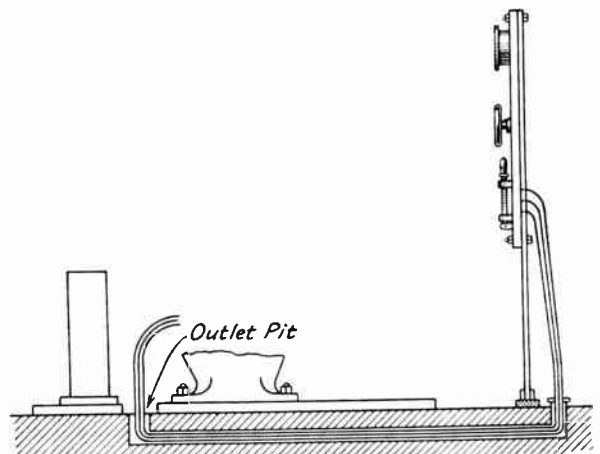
CABLE RUN FROM A TEST PANEL TO THE TEST BED.
